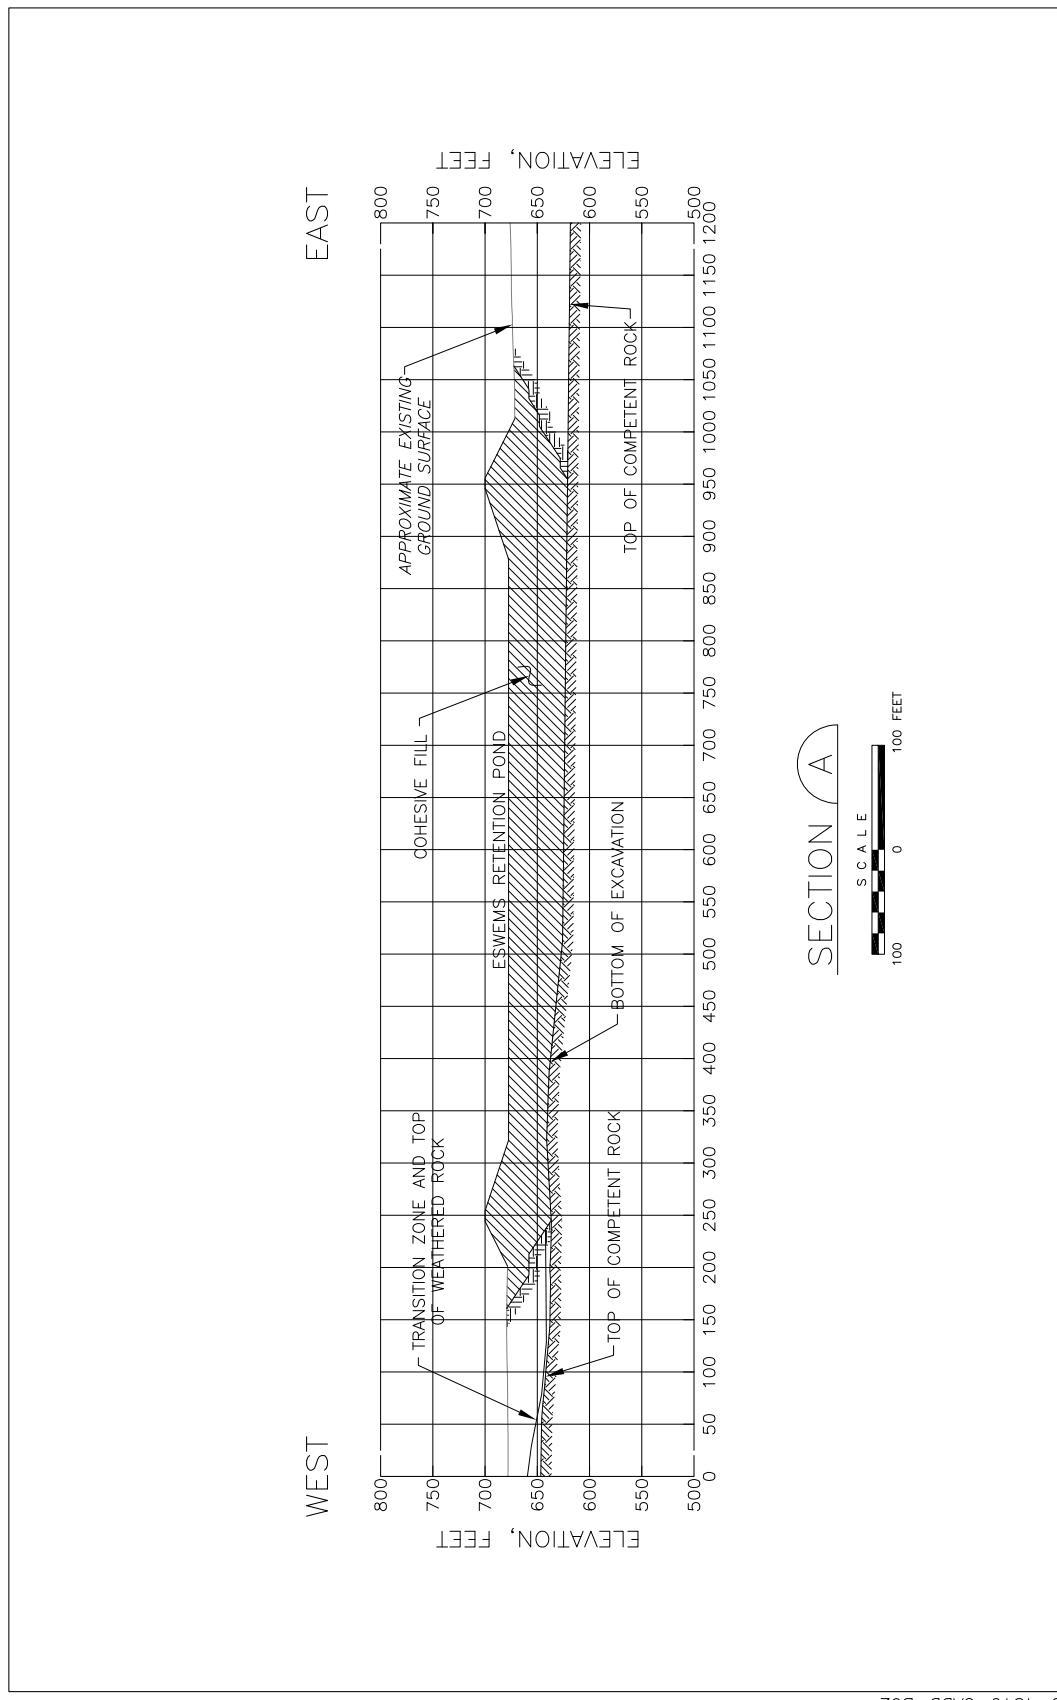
{Permanent Slope Section A, ESWEMS Retention Pond}
